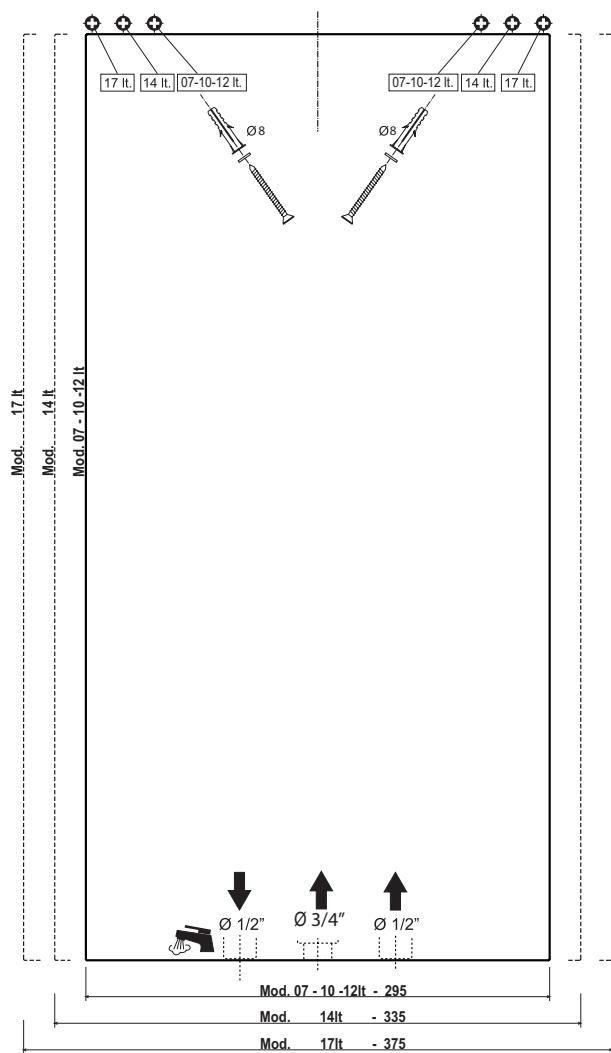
Assembly template 7,10,11,12,14 and 17lts.
